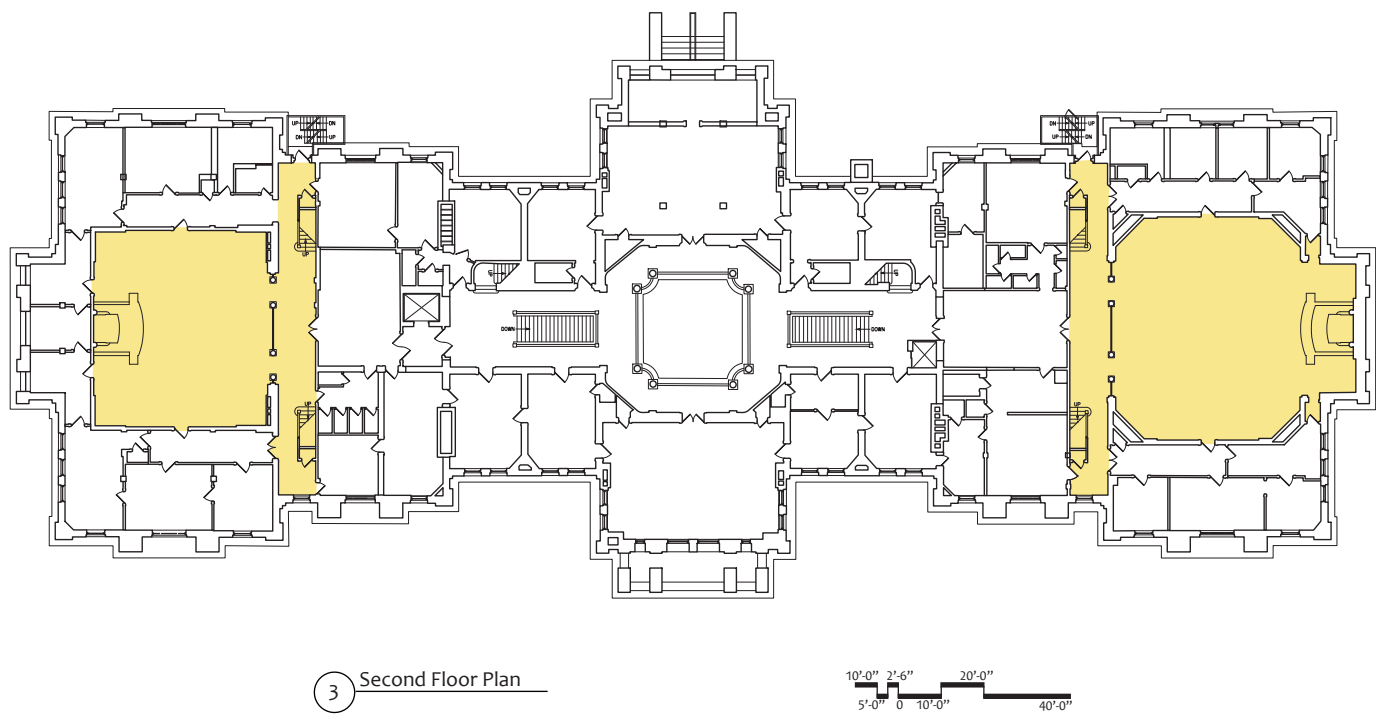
Second Floor Plan of Senate (left) and House Chambers [highlighted in yellow]
